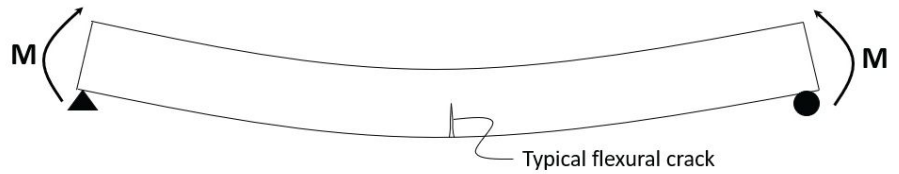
Elevation of a beam under external loads creating a pure-bending condition at midspan.
